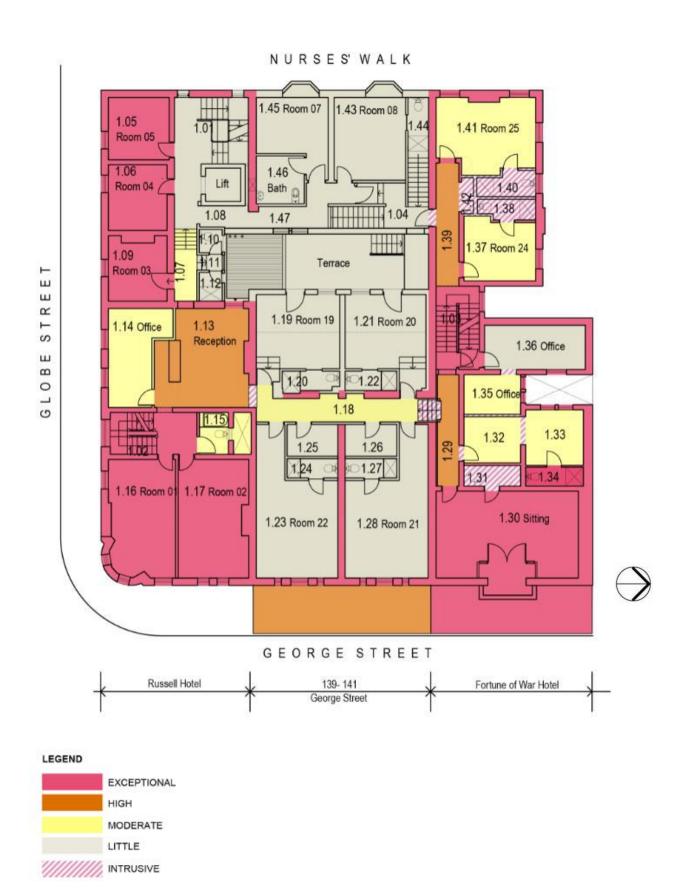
Grading of significance, first floor plan, TKD Architects (not to scale)
